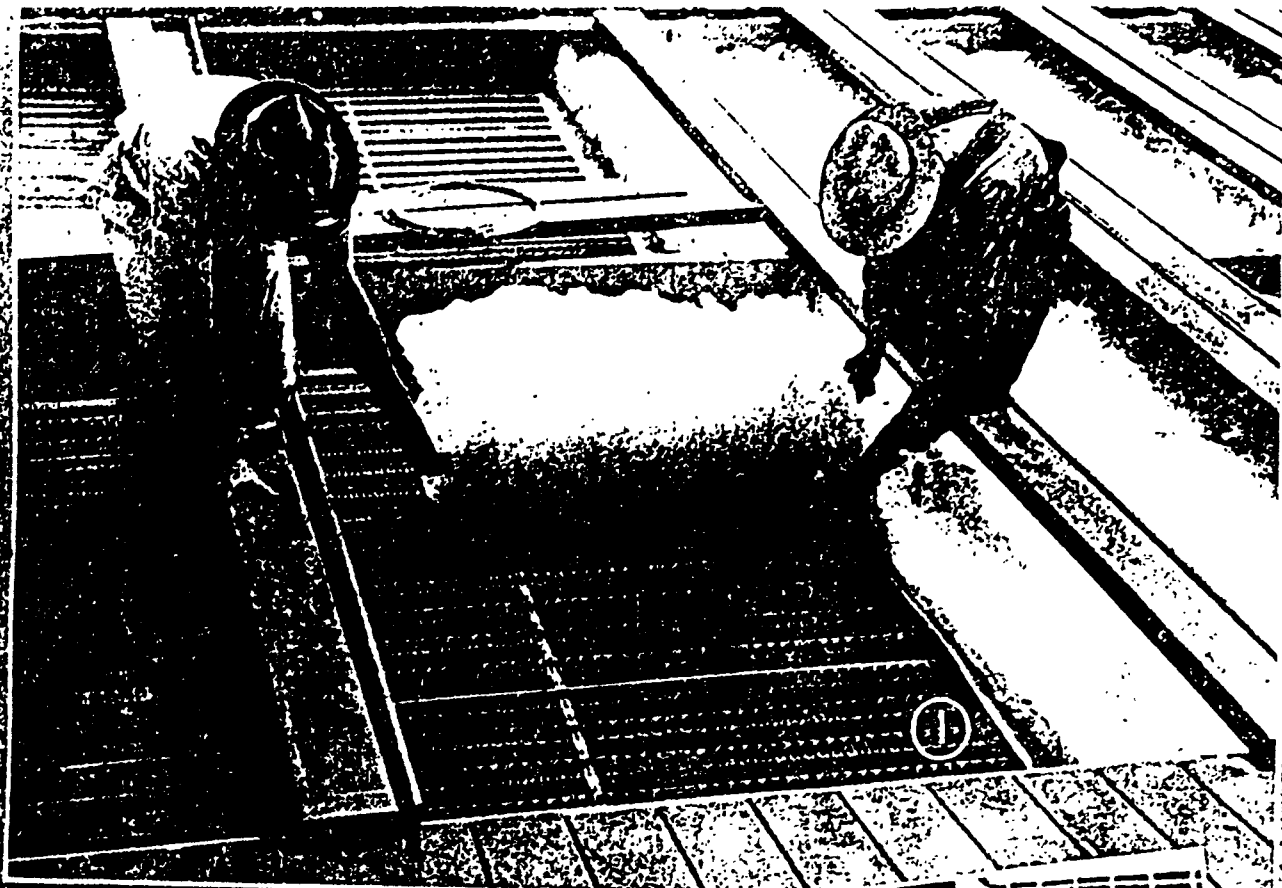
Glass-fiber thermal insulation being installed in the roof of an industrial plant
